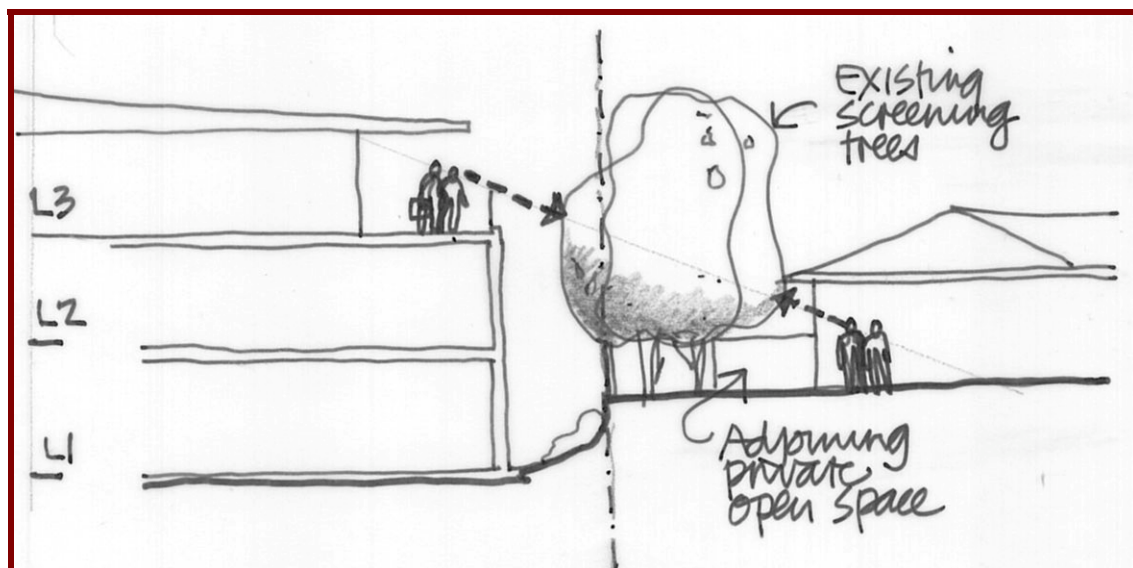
Sketch of section through closest point of balcony to dwelling adjoining park.
